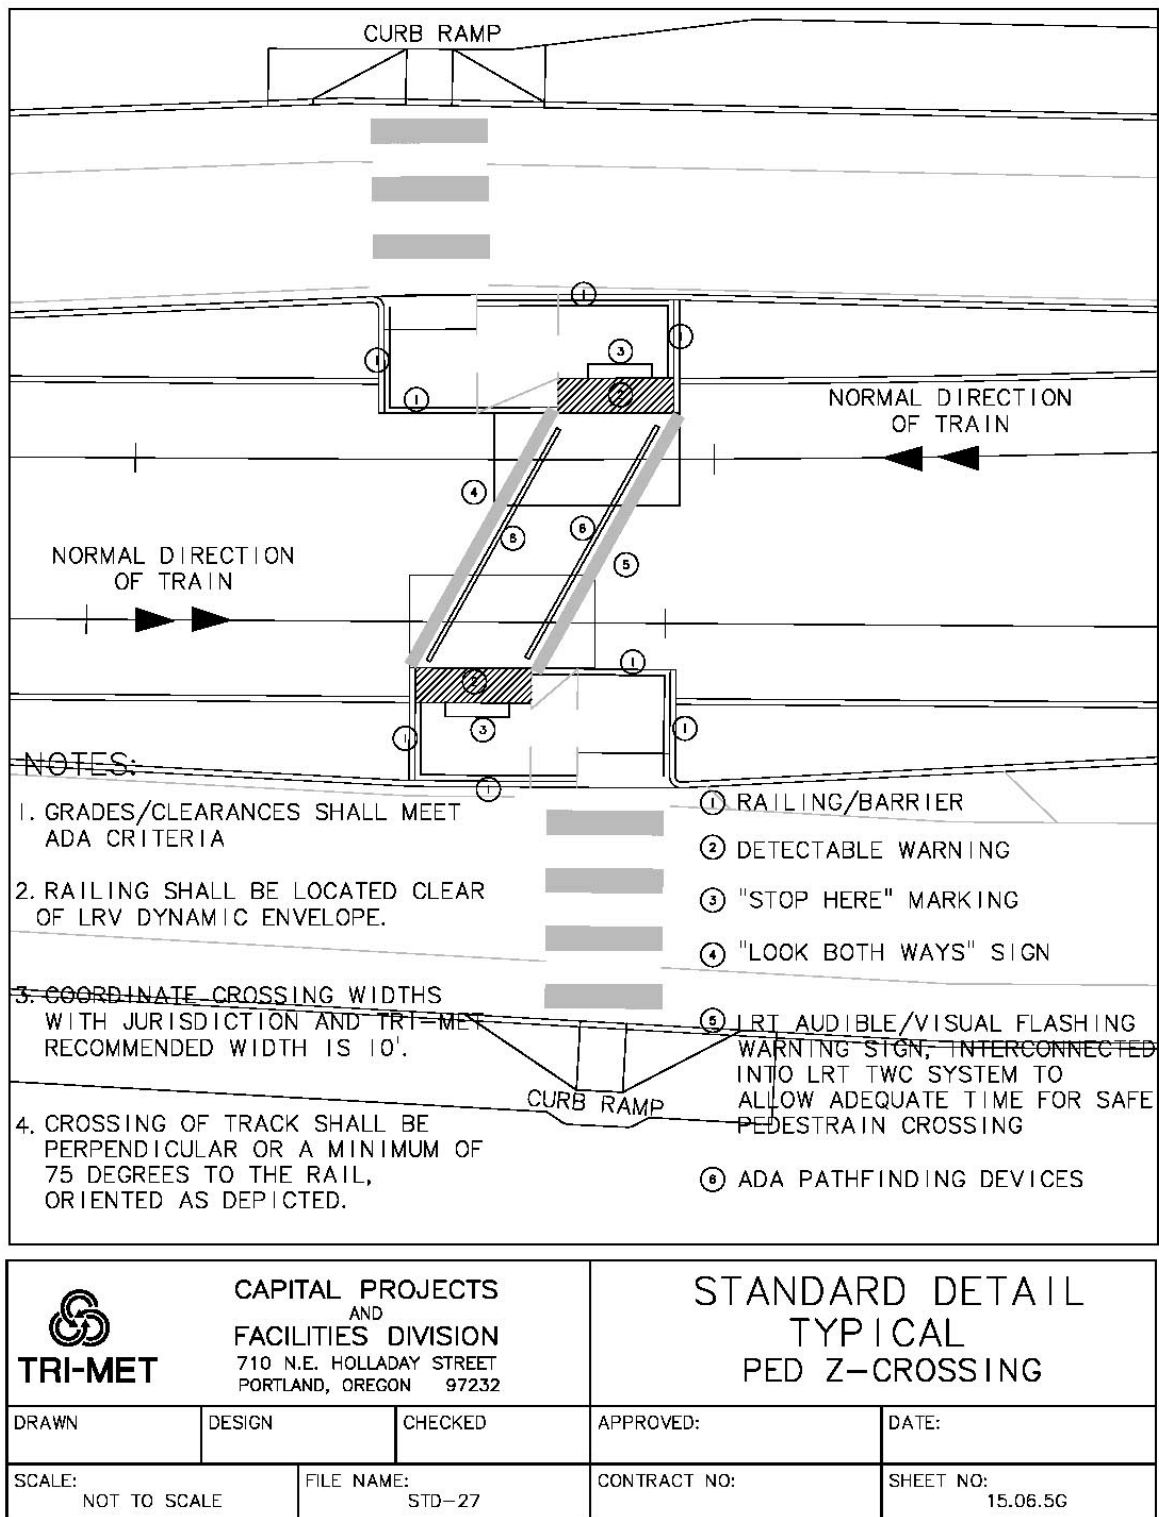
Standard detail of typical pedestrian Z-crossing.
